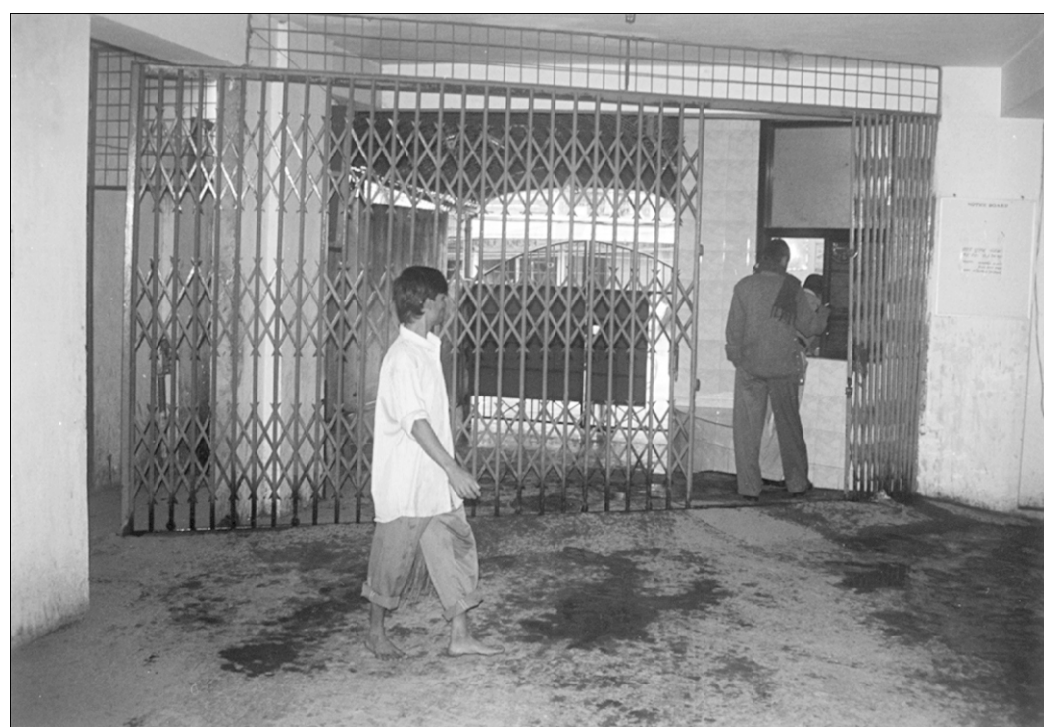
Green Tower Apartment: 20 ft. long covered approach road restricts the accessibility of the fire fighting vehicle near to the building.
